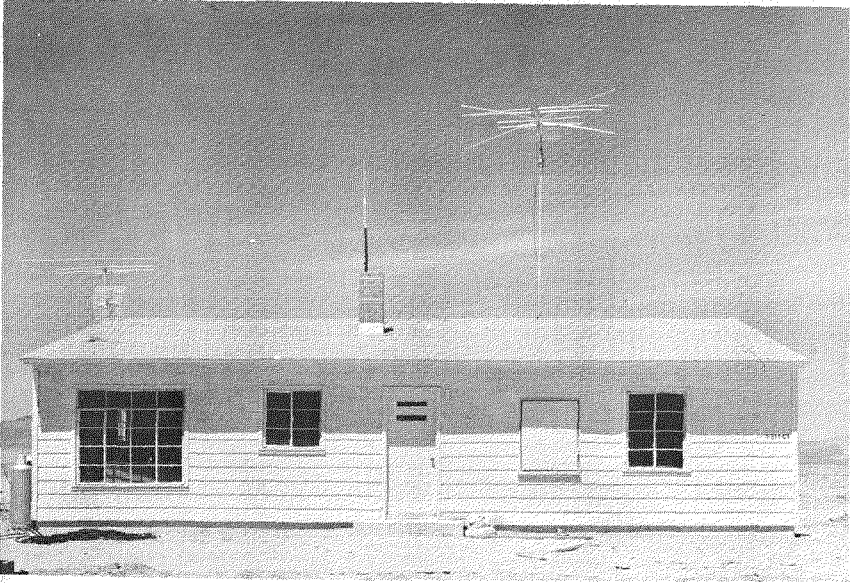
Rambler-type house before a nuclear explosion, Nevada Test Site.
